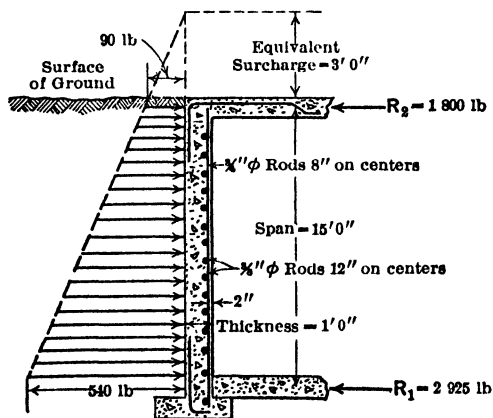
Typical Design of a Basement Wall Subjected to Earth Pressure and Surcharge
